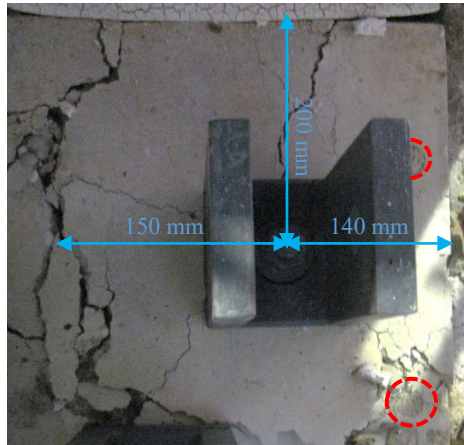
Typical concrete cone failure for expansion anchor size M20 ( $h_{ef} = 100$  mm).
